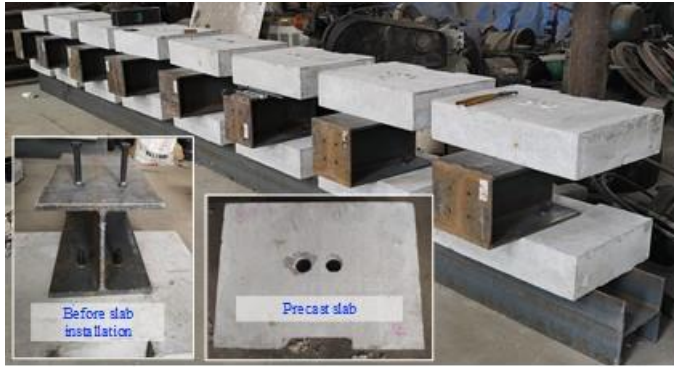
illustrates key steps of the prefabrication of specimens, which includes machining of conical nuts on the basis of the standard hexagonal nut, drilling chamfered holes on beam flange, positioning and fastening the bolts by the locking nut configuration, as well as casting concrete slabs with performed holes, were performed in the workshop. After fabrication of all these components, the assembly of the steel beam and precast concrete slabs was performed. First, a pair of bolts were installed on the top flange of beam. Each precast slab is installed on the top of steel beam to make sure its opening geometric center coincide with the center of two installed bolts. Fast-hardening infilled grout is then poured into the preformed holes in precast slab. After seven-days hardening of the grout, the specimens was turned up-side-down, and the same assembly procedures were implemented between the precast concrete slab and the steel beam at opposite side. Hardening of infilled grout completes the whole fabrication process of the push-out specimen.
